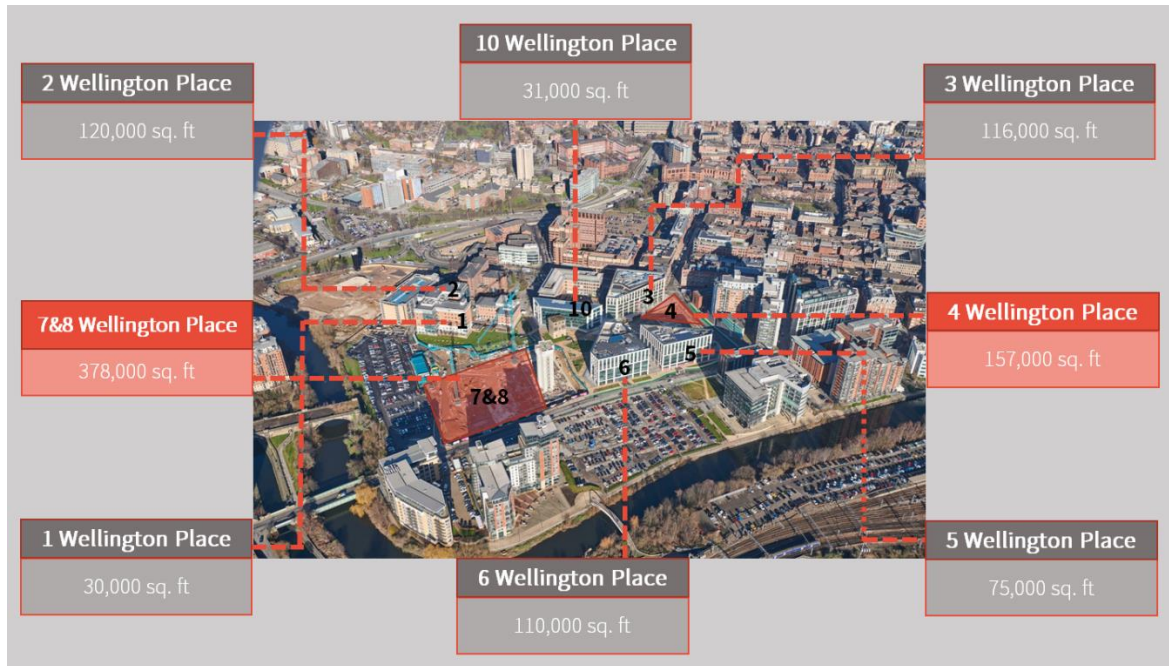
Buildings completed and under construction at Wellington Place, NIA (sq. ft)
